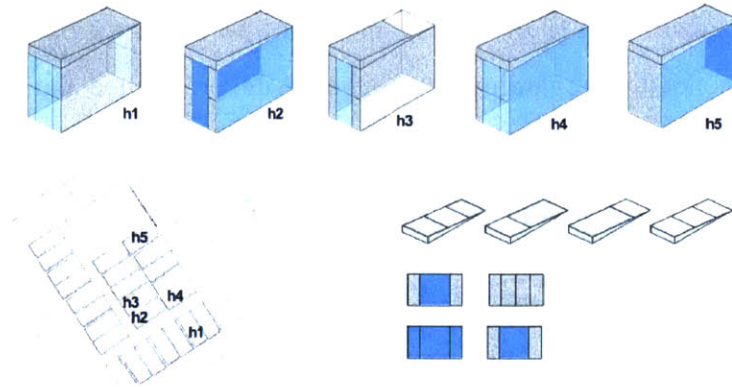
Analytical envelope and planning suggestion. Alternative solutions for 6 housing prototypes with regard to their site and surrounding constraints; Site location and layout, Shinagawa, Tokyo.
